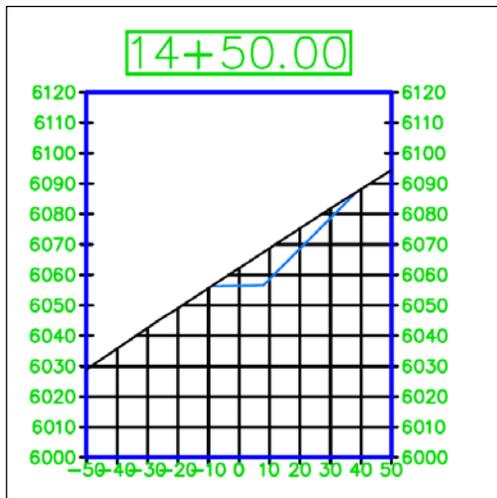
Side view of the average road cut required for the new Deer Creek road realignment.
